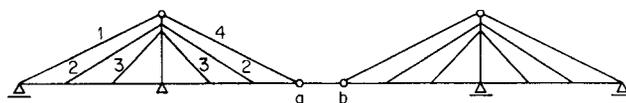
Hinges at a and b reduce the number of redundants for a cable-stayed girder continuous over three spans.
